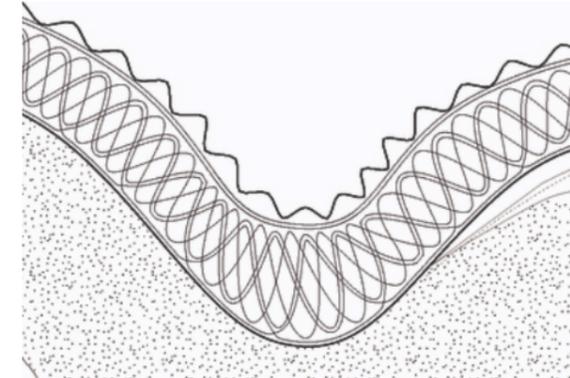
Infill wall (Mario Cucinella Architects, 2021)
